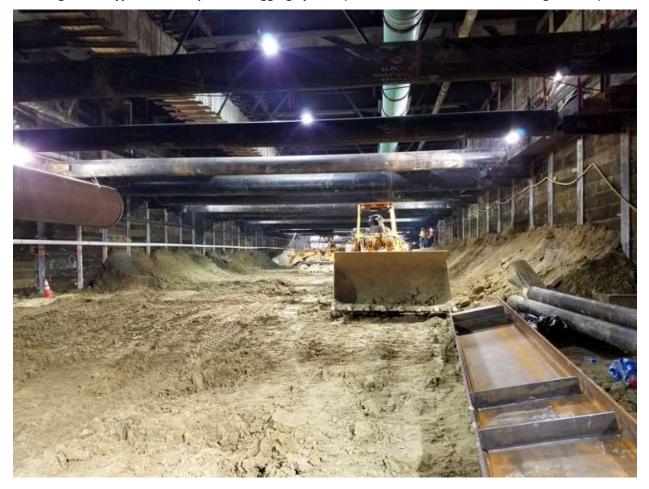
Typical soldier pile and lagging system (Wilshire/La Brea Station, Los Angeles, CA)
